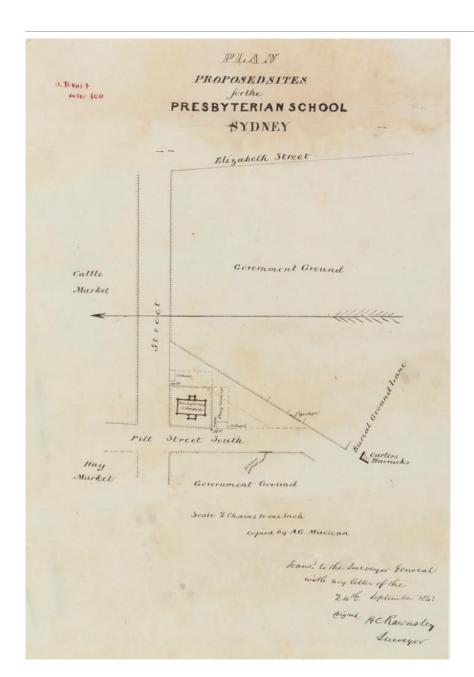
c.1842 proposed plan for Presbyterian church and school buildings at corner Pitt and Hay Streets (Source: SLNSW call no. D Ca 84/14)
